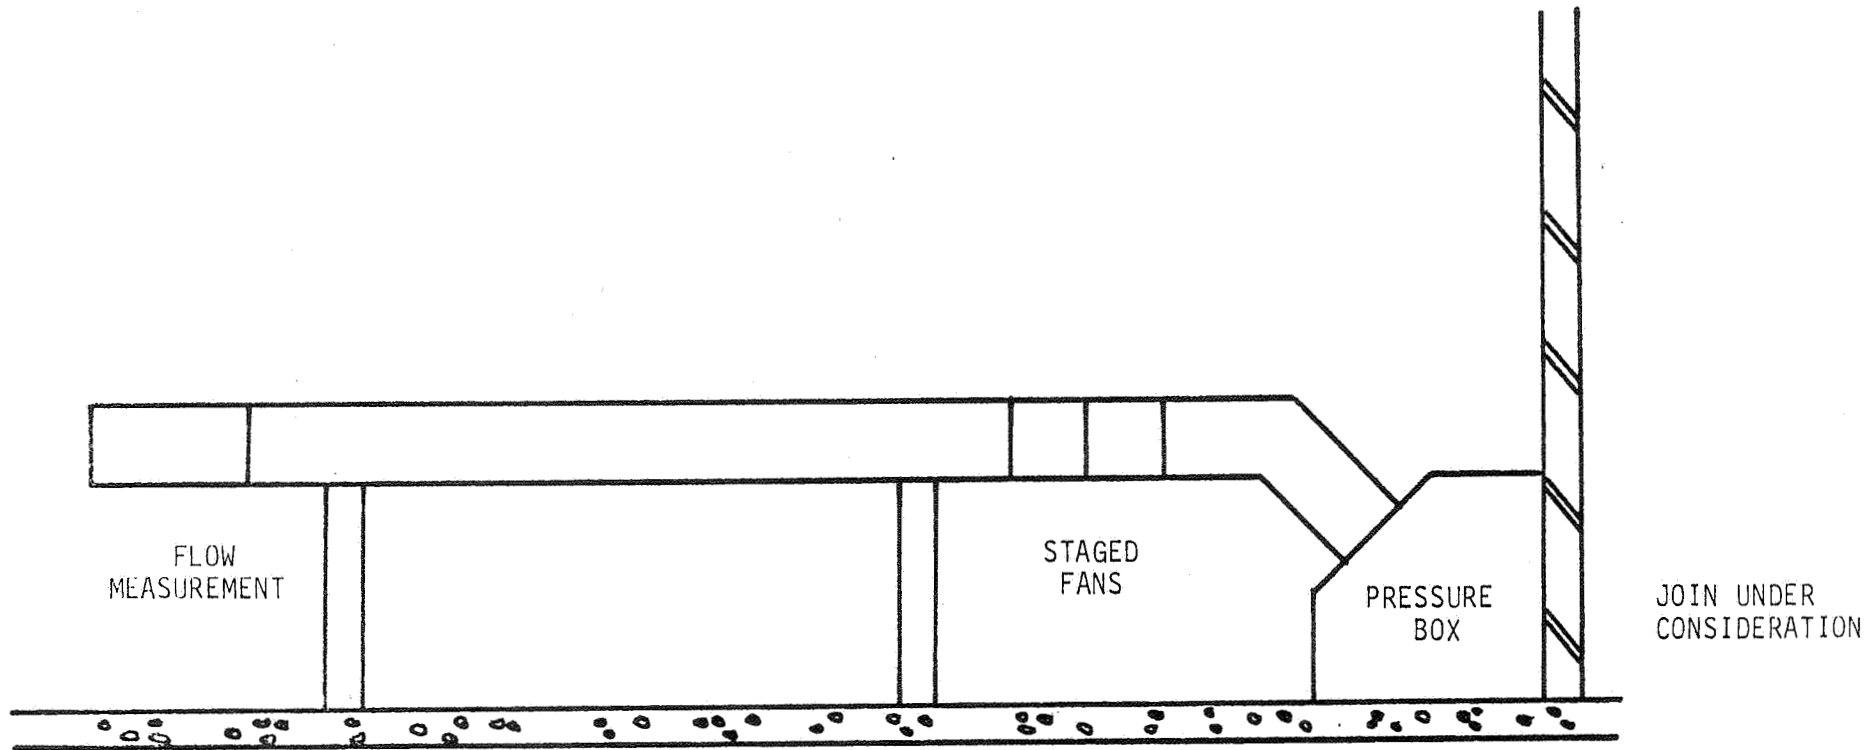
Layout of Pressure Box for Joint Floor Wall Join
